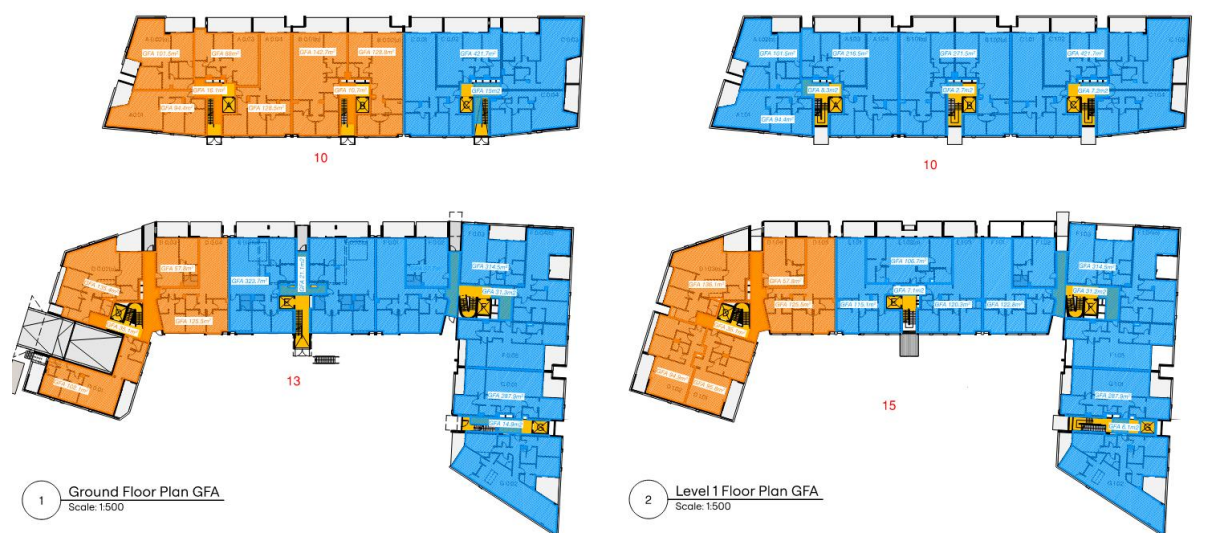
Rev F plan showing Affordable Housing Component (AHC) contain 15 units with counting corridor space providing direct access to the units. Note: AHC in lodged plan contain 15 units and Rev C plans contain 16 units with 15% of all corridor space added to comprise the 15.1% required by the Housing SEPP.
